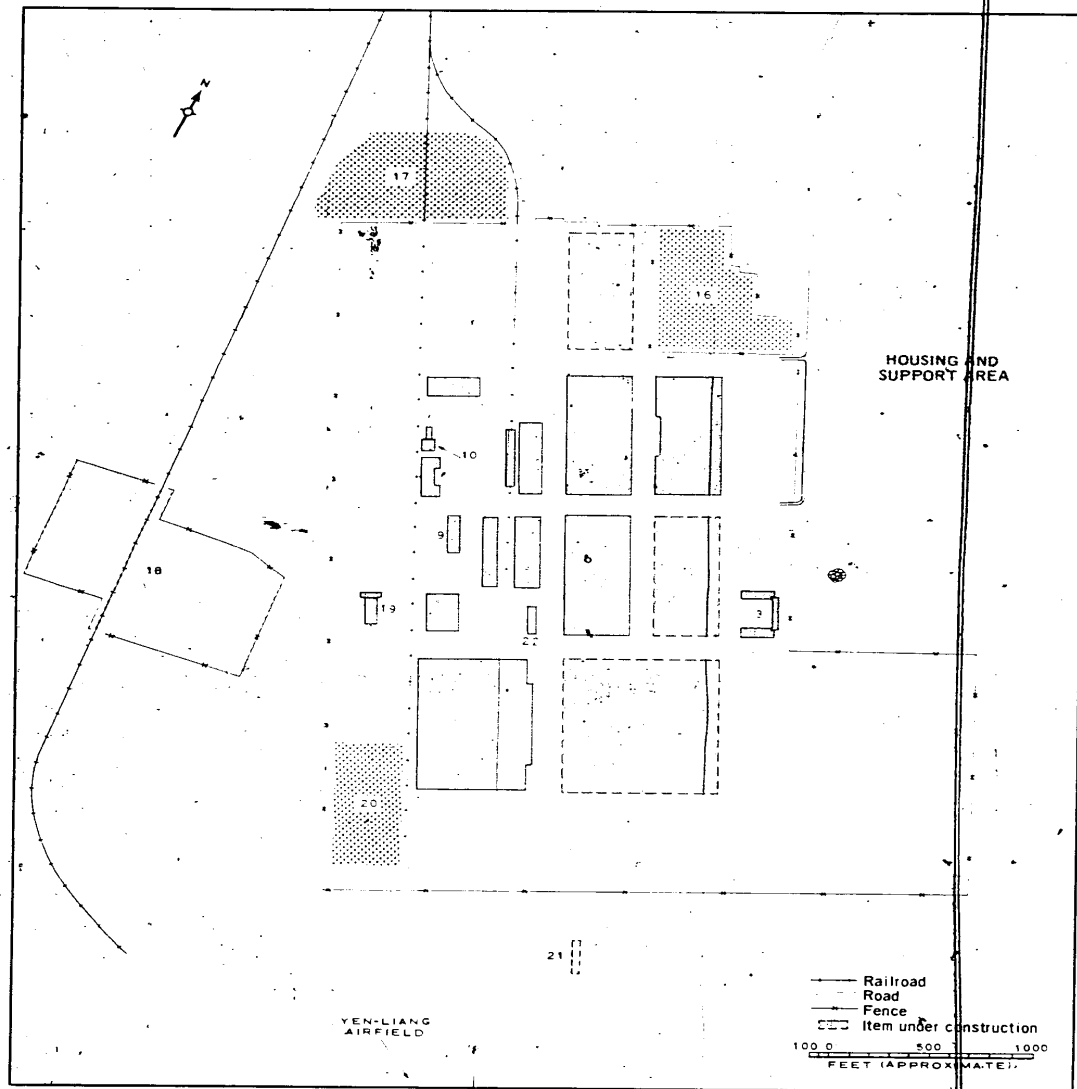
LAYOUT OF YEN-LIANG AIRFRAME PLANT.
